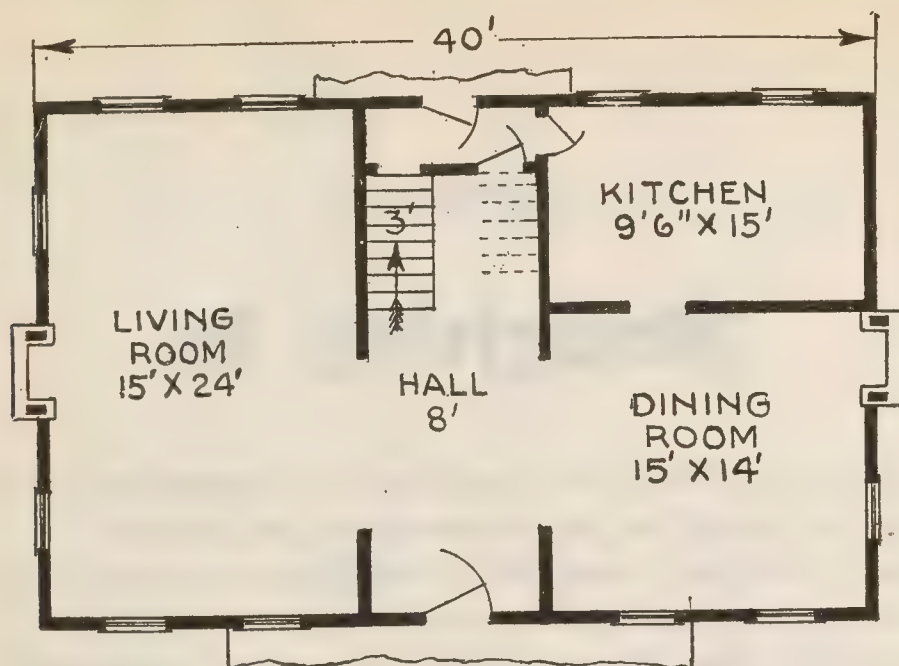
,909.—Small wooden house; *plan 1st floor*, illustrating roughing in work in old building
